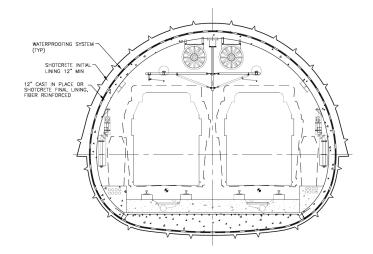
Preliminary Engineering Typical Cross Section with space proofing.
